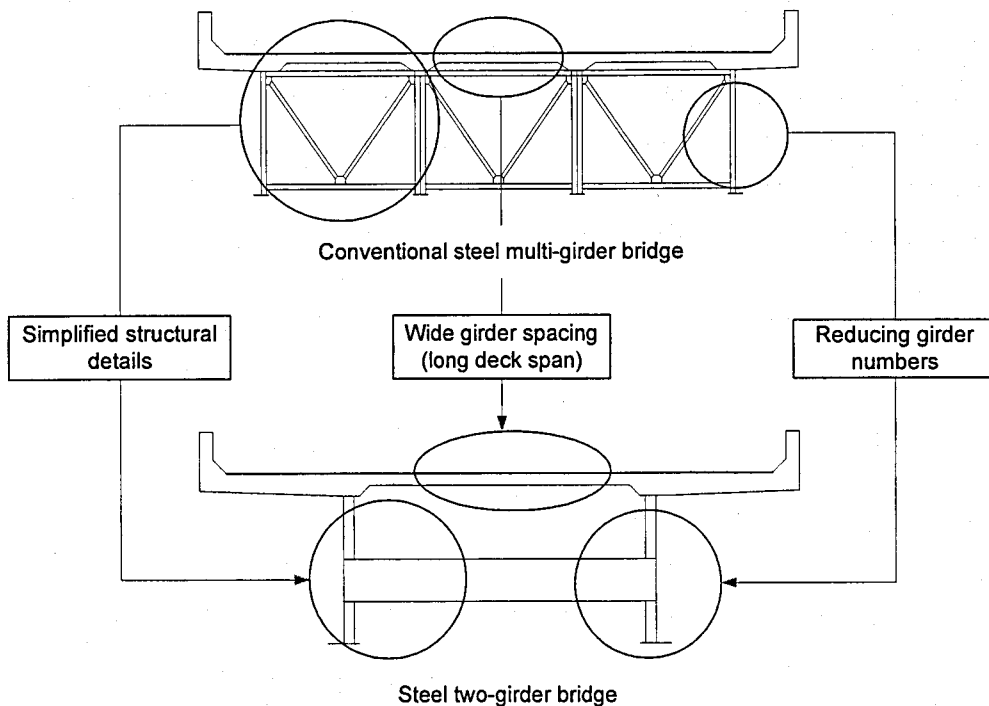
Structural features: two-girder bridge vs. multi-girder bridge
